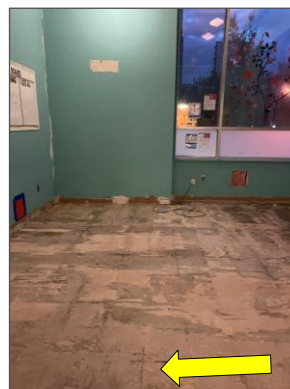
Remaining vinyl floor tiles removed, Lounge/Café Area Ground Floor (Photo sent from contractor, October 12, 2023)
